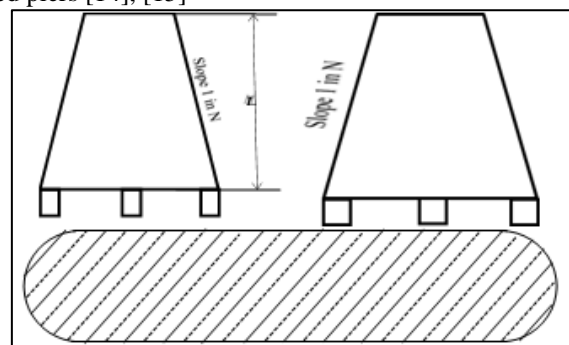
Plan and Elevations of typical Solid Gravity Pier used in this study [16]
